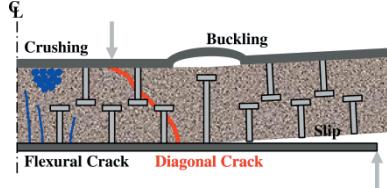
Major failure modes of an SCS sandwich beam (modified from [4])
